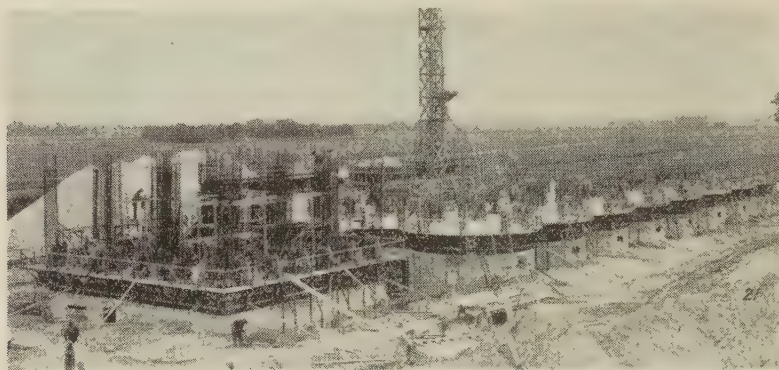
SHELLABARGER ELEVATOR AND MILL CO'S. ELEVATOR AT SALINA, KANSAS
